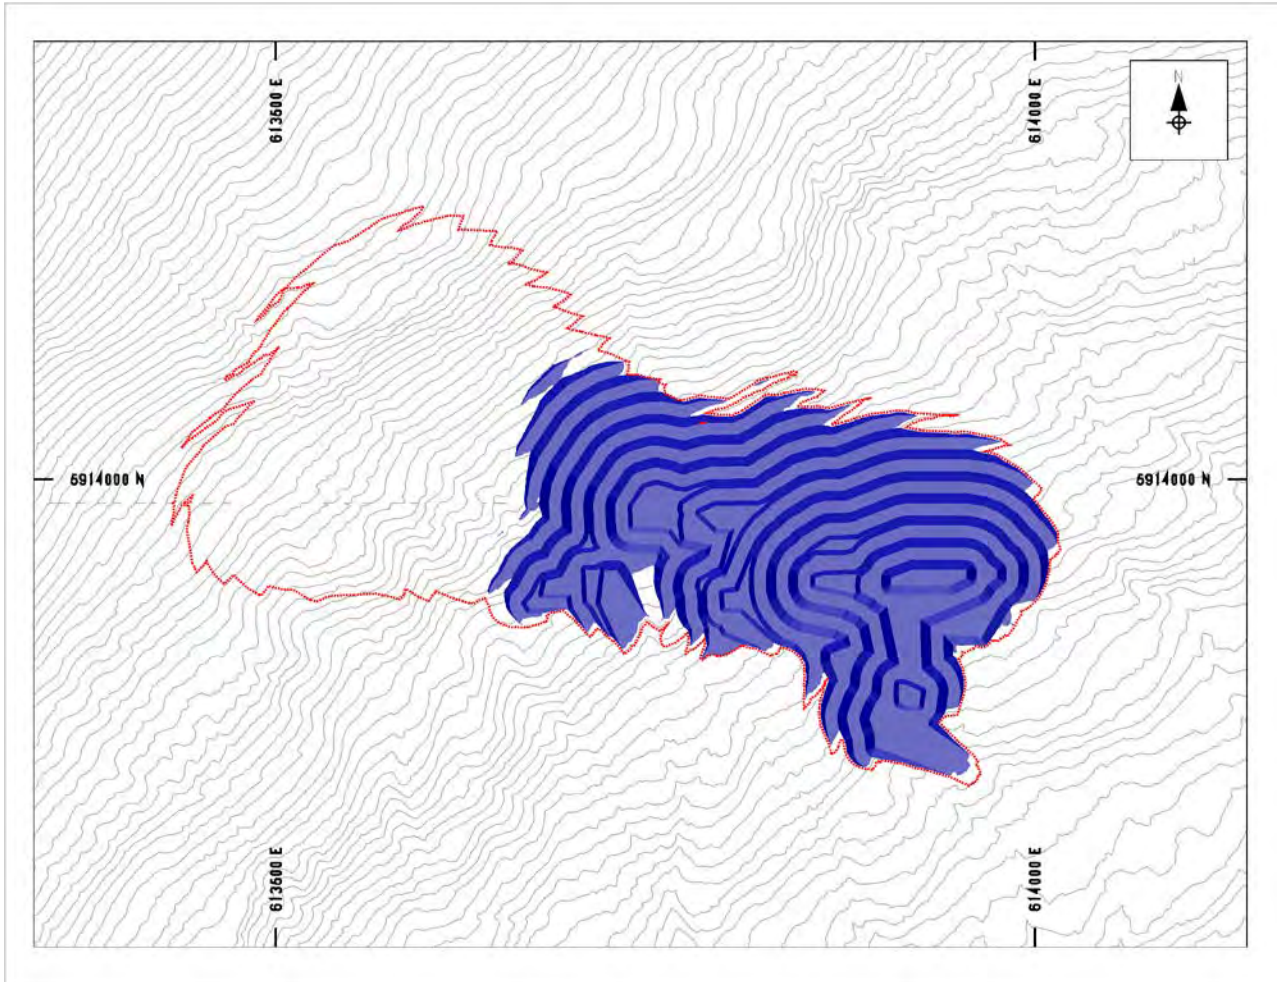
Plan View of Starter Pit d653 with the Pit Limit Outline
